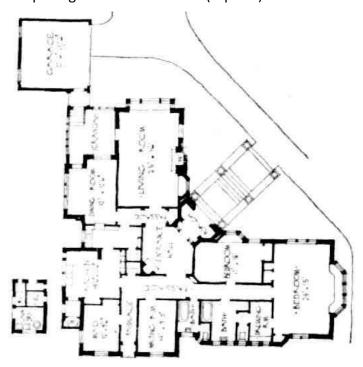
Plan of 97 Argyle Road, then under construction. (Source: The Herald, 8 May 1929:15)
